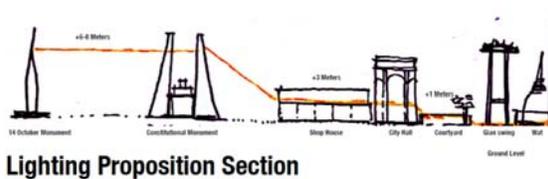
Proposed lighting proposition from Bangkok City Hall toward Rajadamnern road
